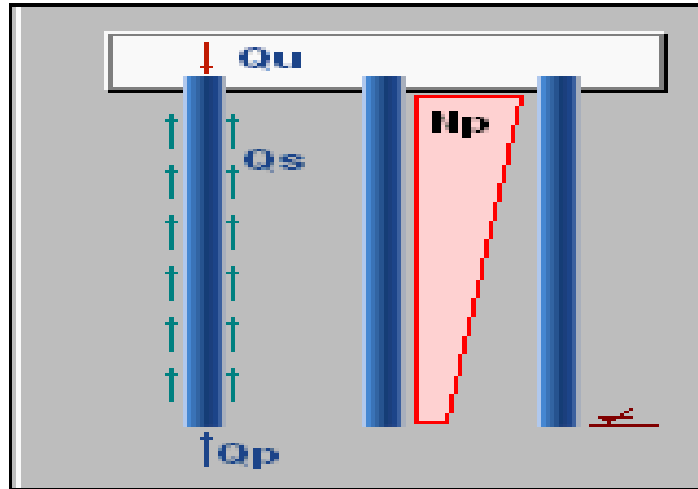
Sections in Pile Foundation (STA4-CAD Handbook)
